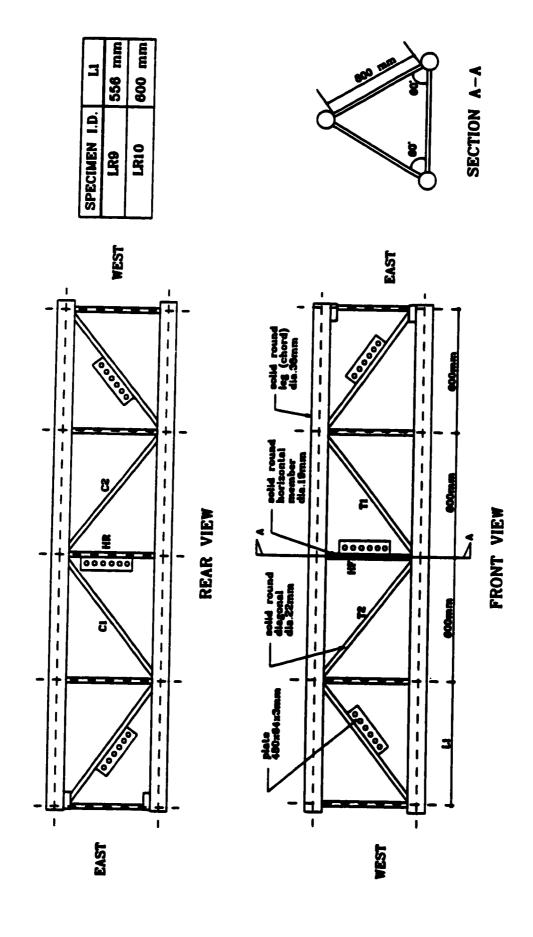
Dimensions of Specimens LR9 and LR10
